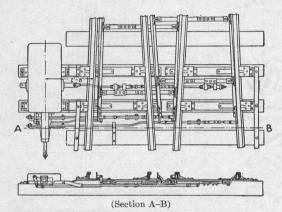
Double Slip Switch Operated by Model 4 Switch Machine
